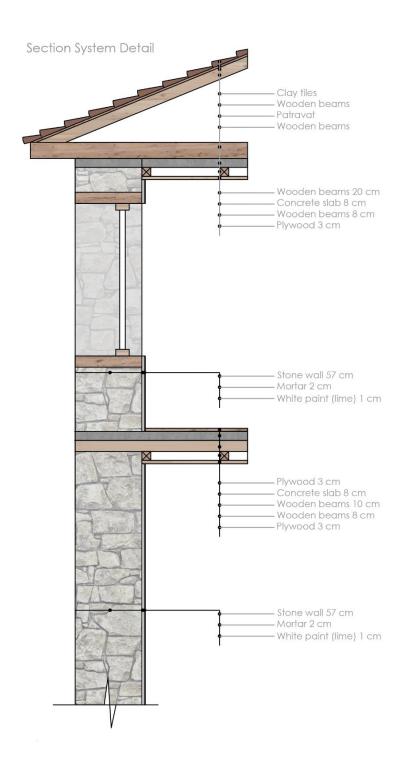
Beqiri, A. (2024) Lluke Zanati House Section System Detail
